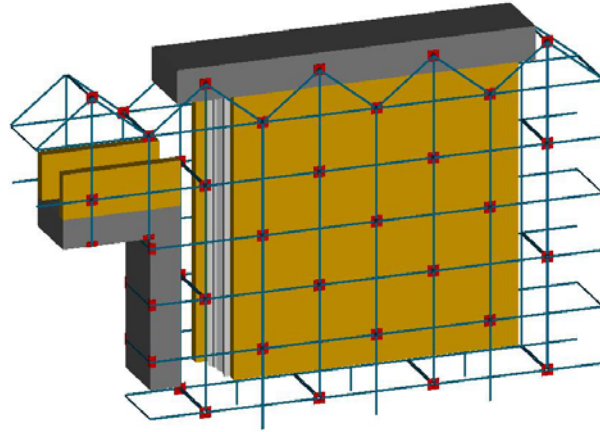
CAM - arrangement in a wall with a door and a R/C upper kerb.
